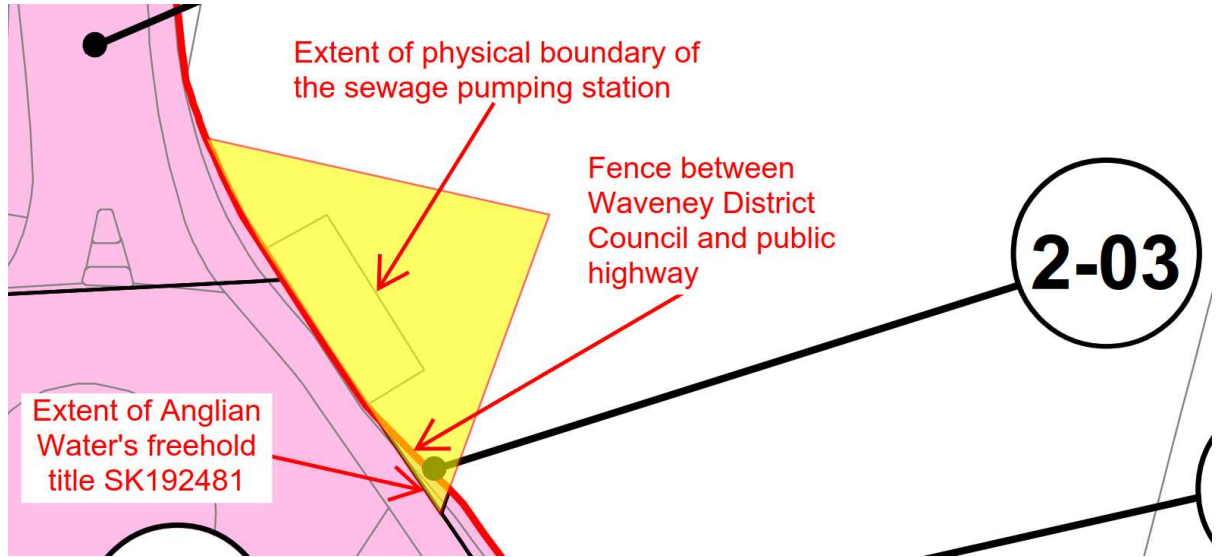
Extract from APP-018 - 2.3 Land Plans (Sheet 2 of 5)
